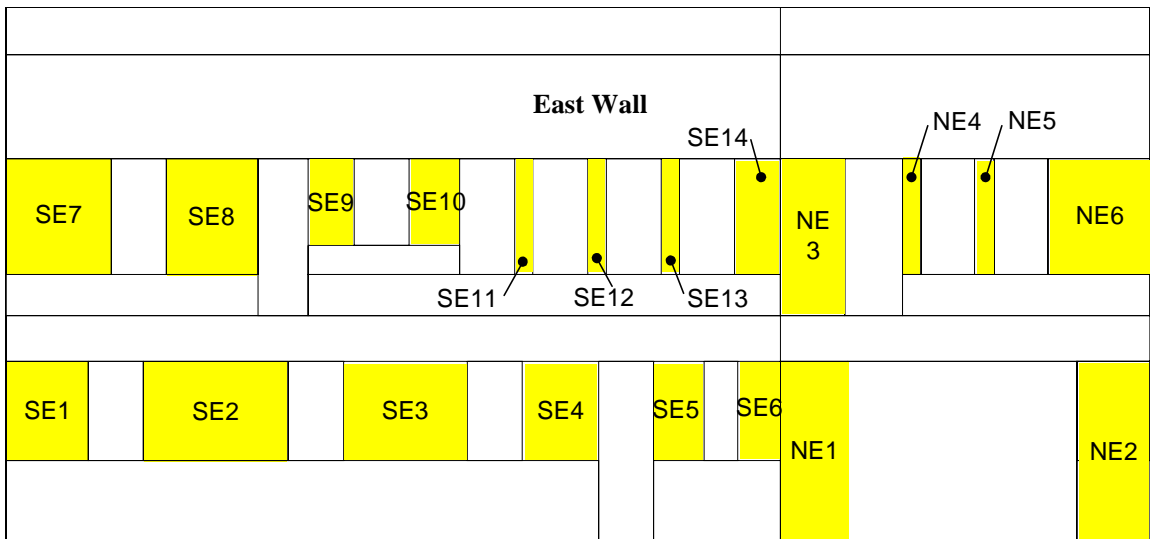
piers of east wall using the pier-type collapse mechanism.
